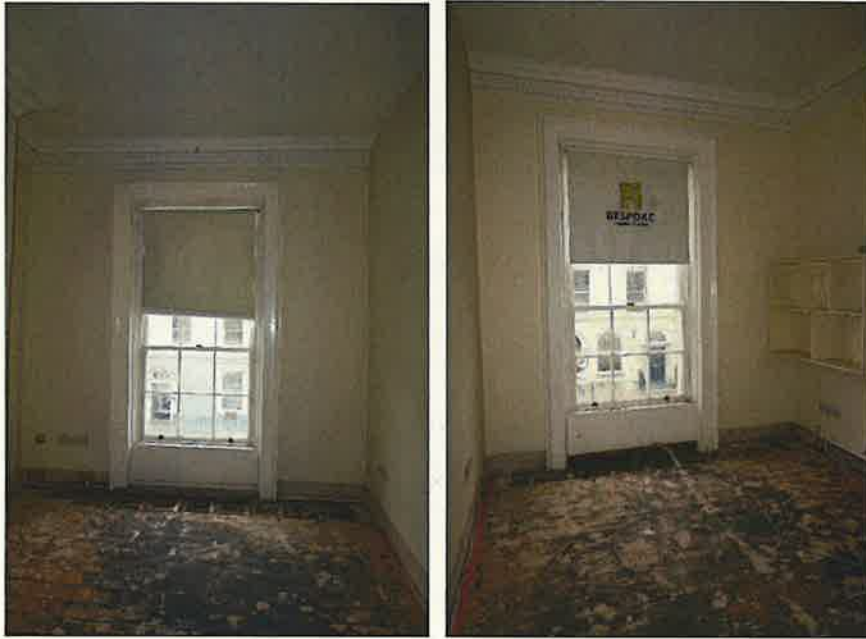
View of the internal wall of the historic fabric at third floor level
